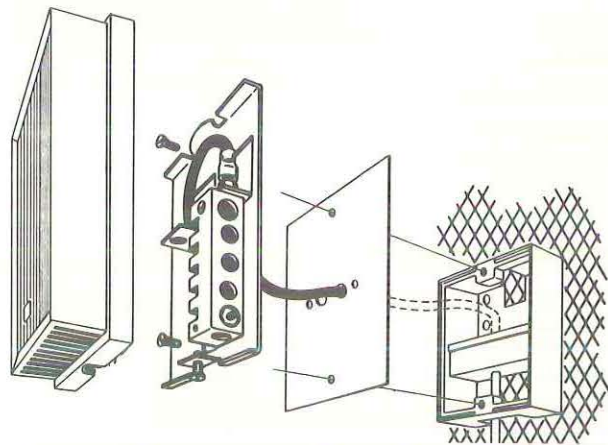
Mounting Wall Type Transmitter to AT-516 Wall Box
